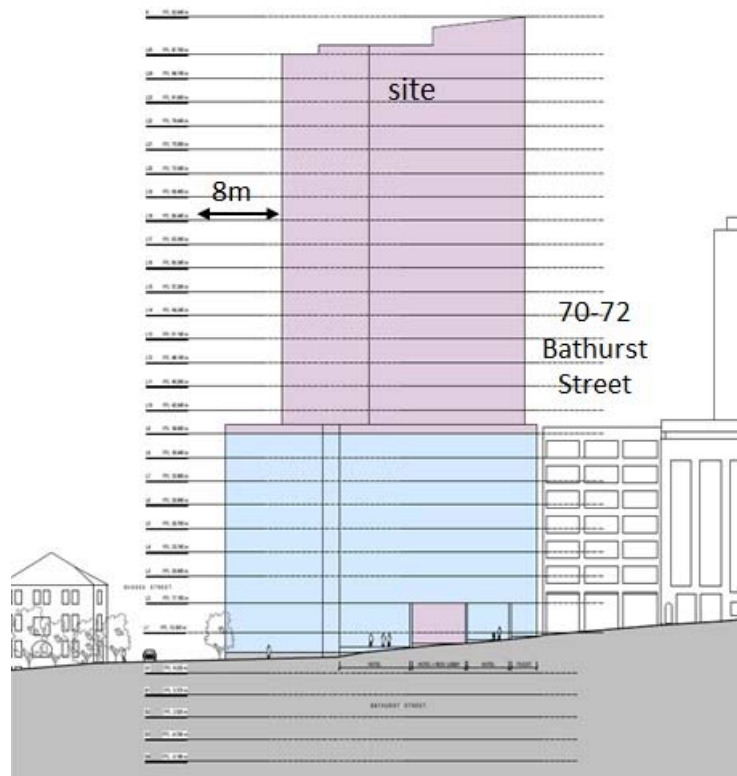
Southern (Bathurst Street) elevation of Stage 1 concept approval showing 8m approved setback above street wall height to Sussex Street.
